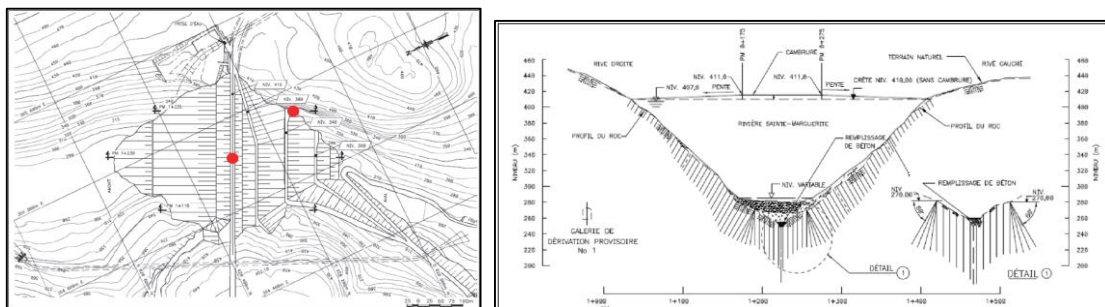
a) Plan view of the Denis-Perron dam, 1b) Longitudinal section of the valley in the central dam axis
